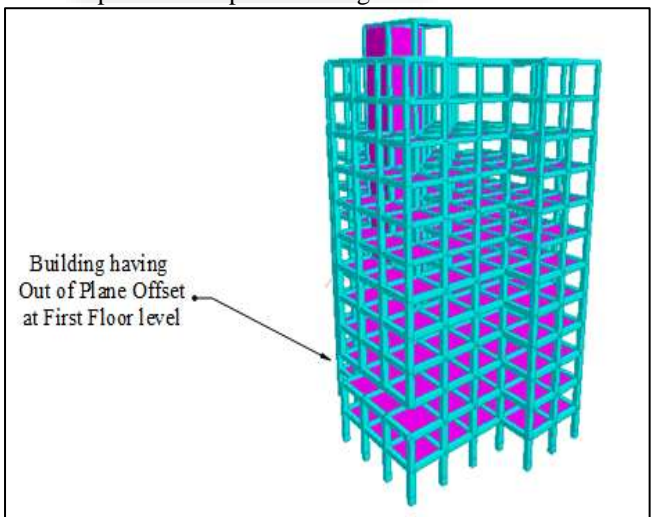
OPO Case 2 - Residential Apartment having out of plane offset provided at 1st floor level
